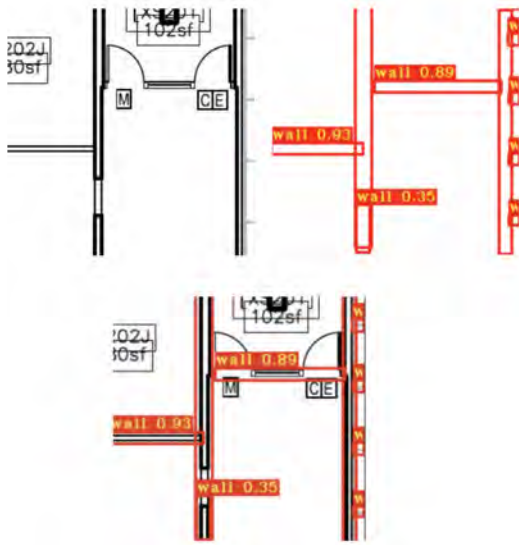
Original small portion of floorplan (upper-left), bounding boxes (upper-right) and floorplan with bounding boxes (lower)
